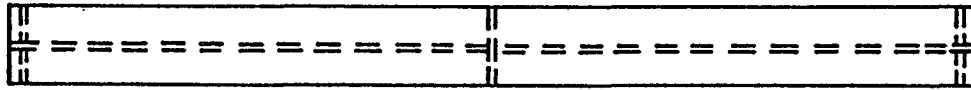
(a) Plan View of Plate Girder as Fabricated by Conventional Methods
